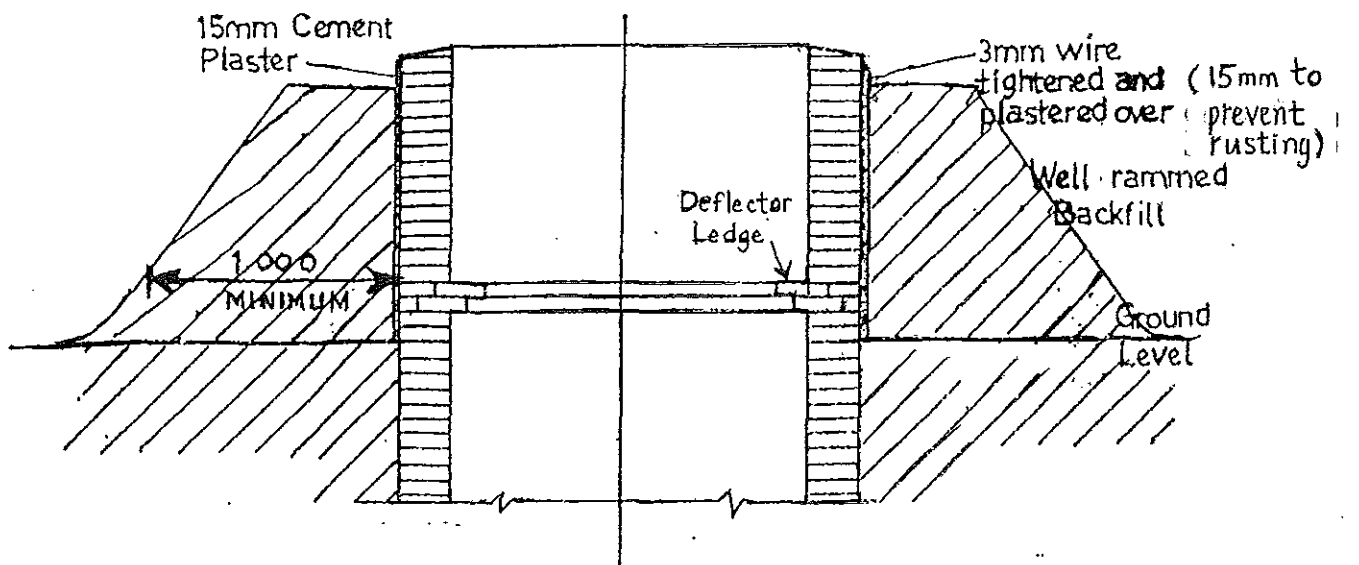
Method for Strengthening Brickwork above Ground Level
